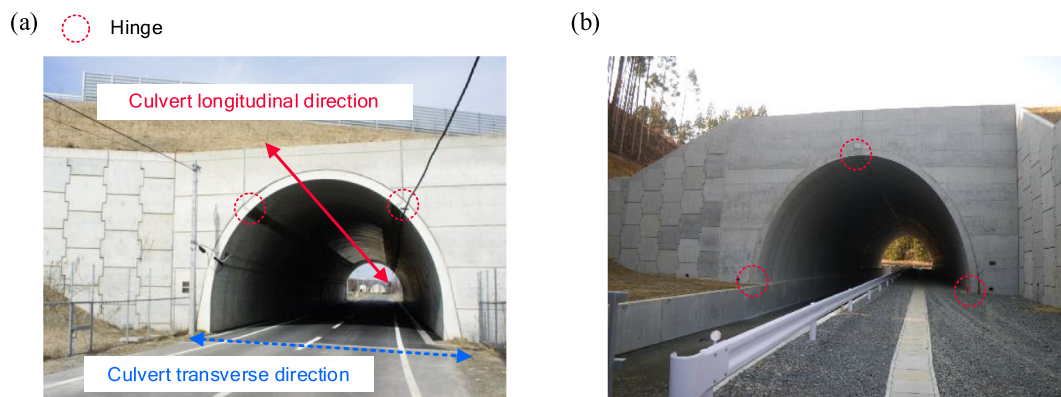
Hinge types of precast arch culverts: (a) two-hinged arch culvert and (b) three-hinged arch culvert.
